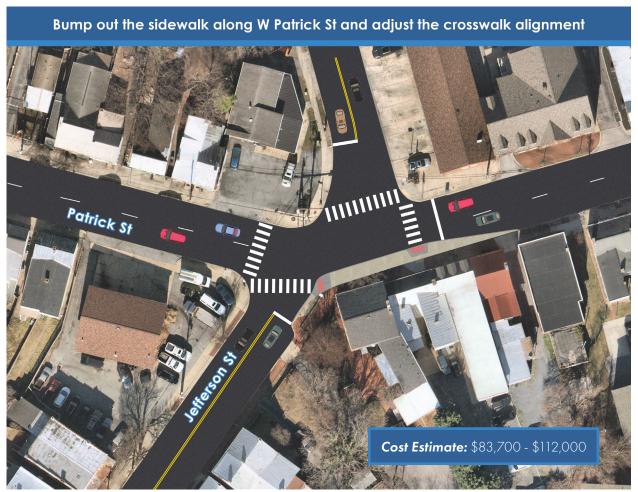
Proposed Improvements for Jefferson St and Patrick St Intersection
